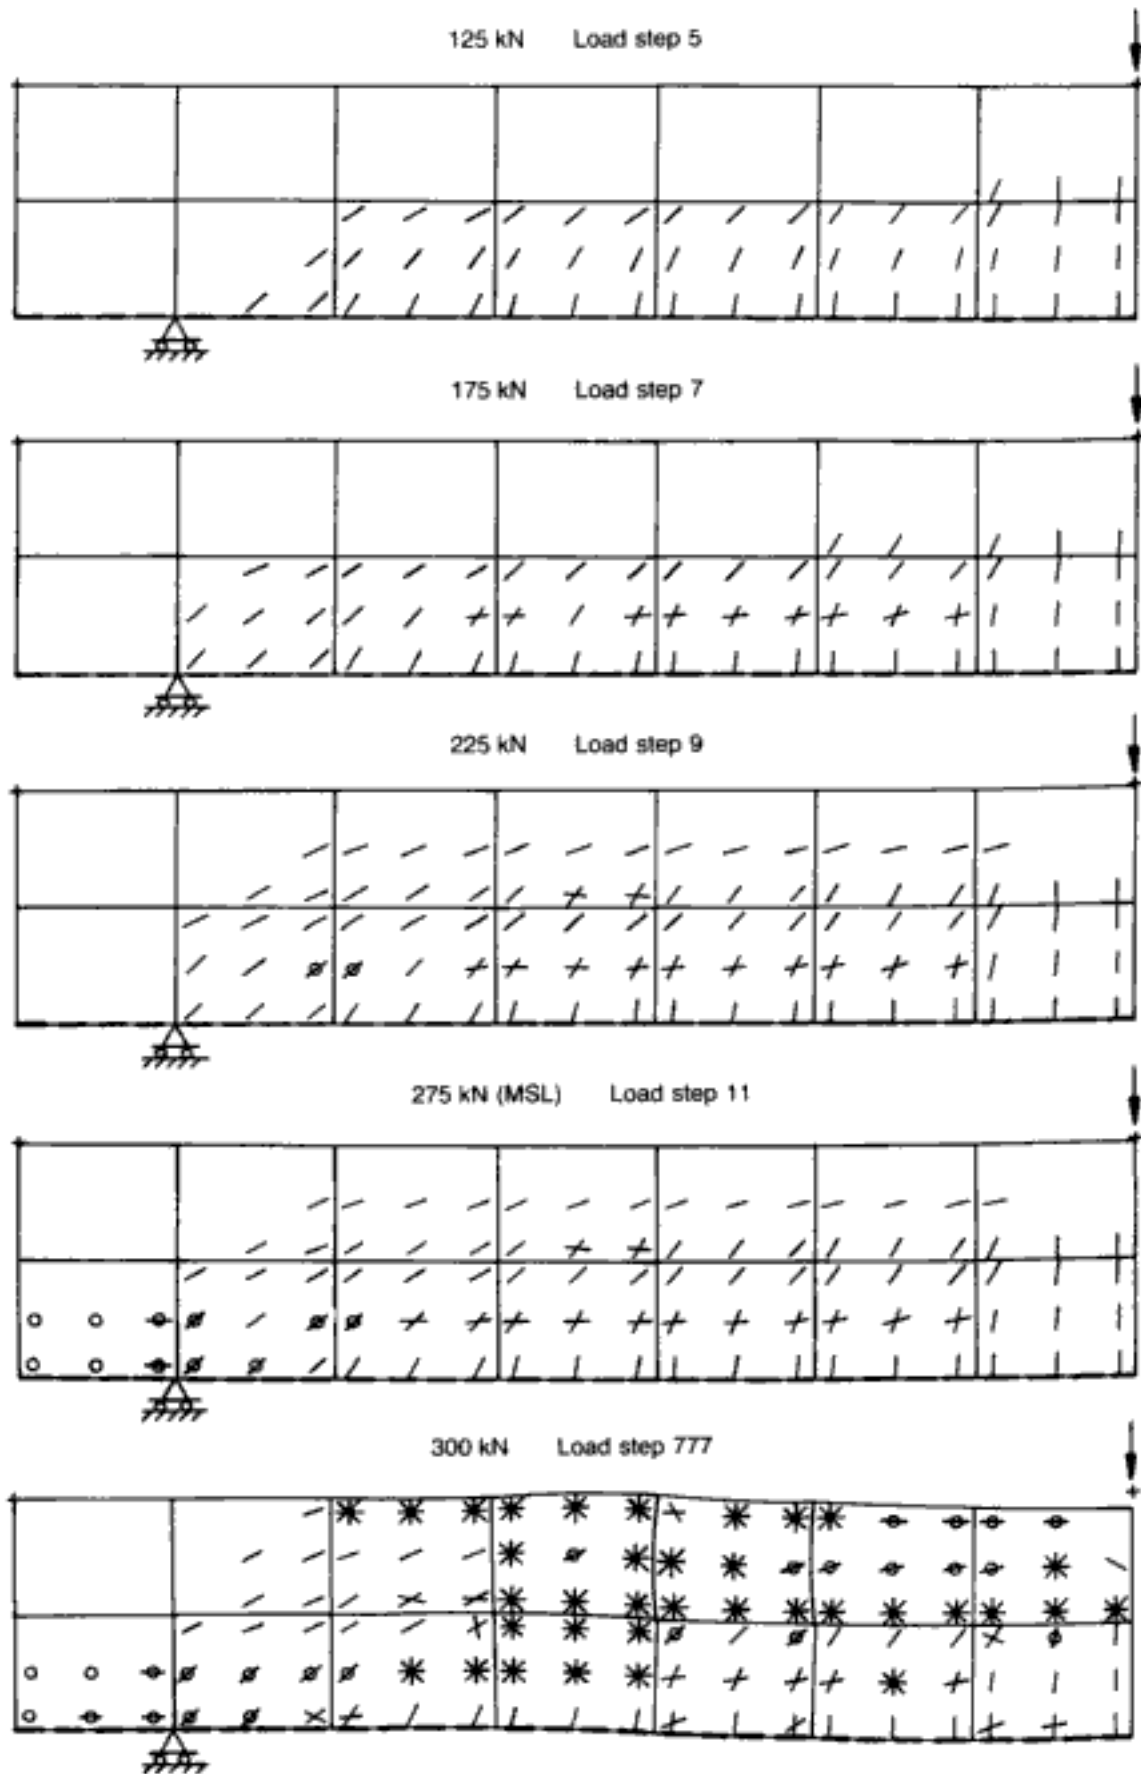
RC beam without stirrups under central point loading (CS3). Crack patterns and deformed shapes at various load stages for full integration combined with the ignoring of residual forces for second and third cracking (run 7)¹⁶¹
